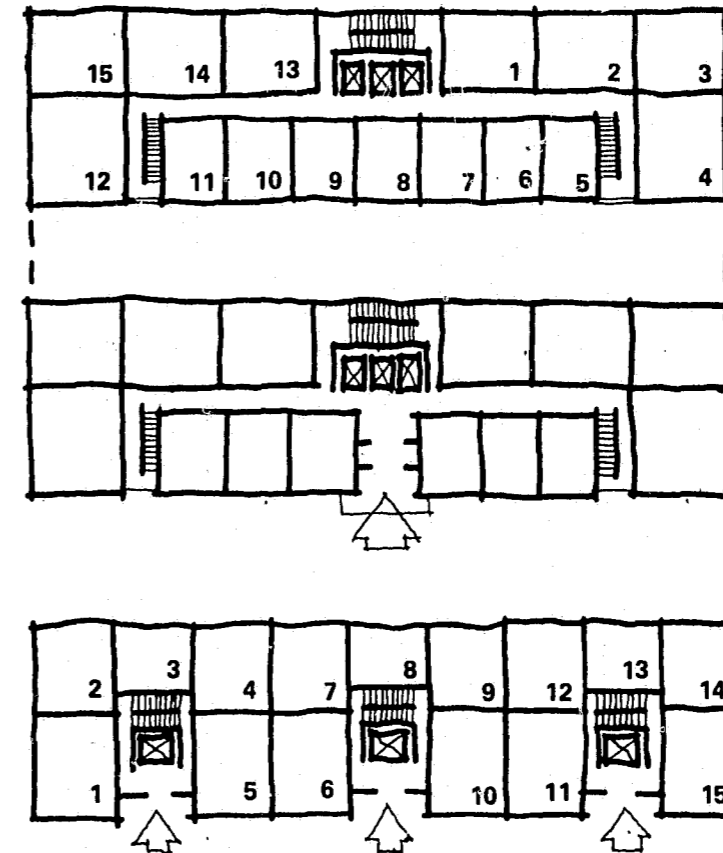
Typical floor and ground floor plan: three elevators banked in a 10-story building serving 149 families, at 15 families per floor (14 families on the ground floor).
